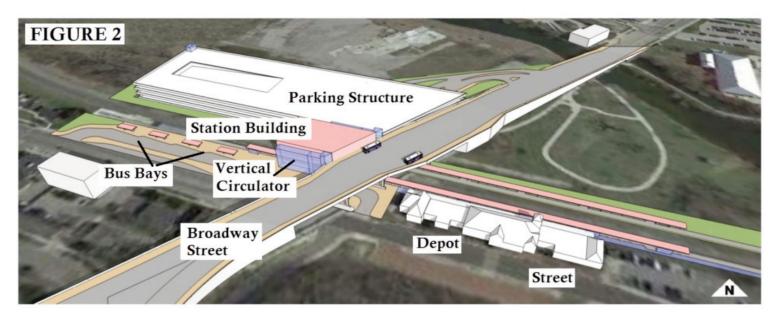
shows the Alternative Site (at the existing station) on Depot Street on the west side of Broadway Street. The elevated station building is over the tracks at the west side of the Broadway Street Bridge. Much of the land for the parking structure is now slated to be part of a recently announced real estate development and is no longer available for expansion of the station site. (From: EA, Ann Arbor Intermodal Station, City of Ann Arbor.)
